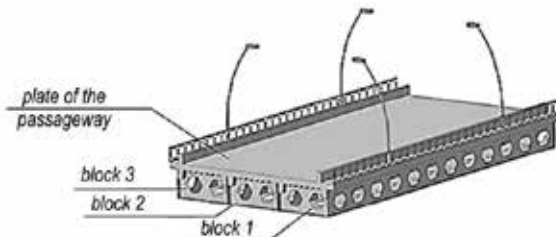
Fragment of the proposed steel-reinforced concrete girder structure.
